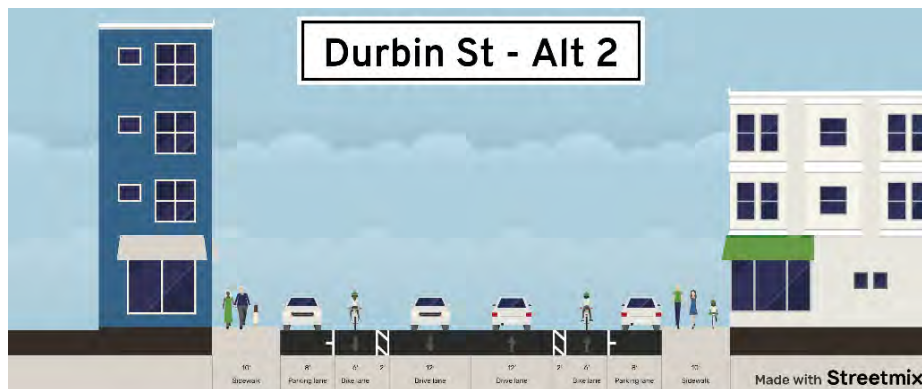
DURBIN ST ALTERNATIVE 2 PROPOSED CROSS SECTION
